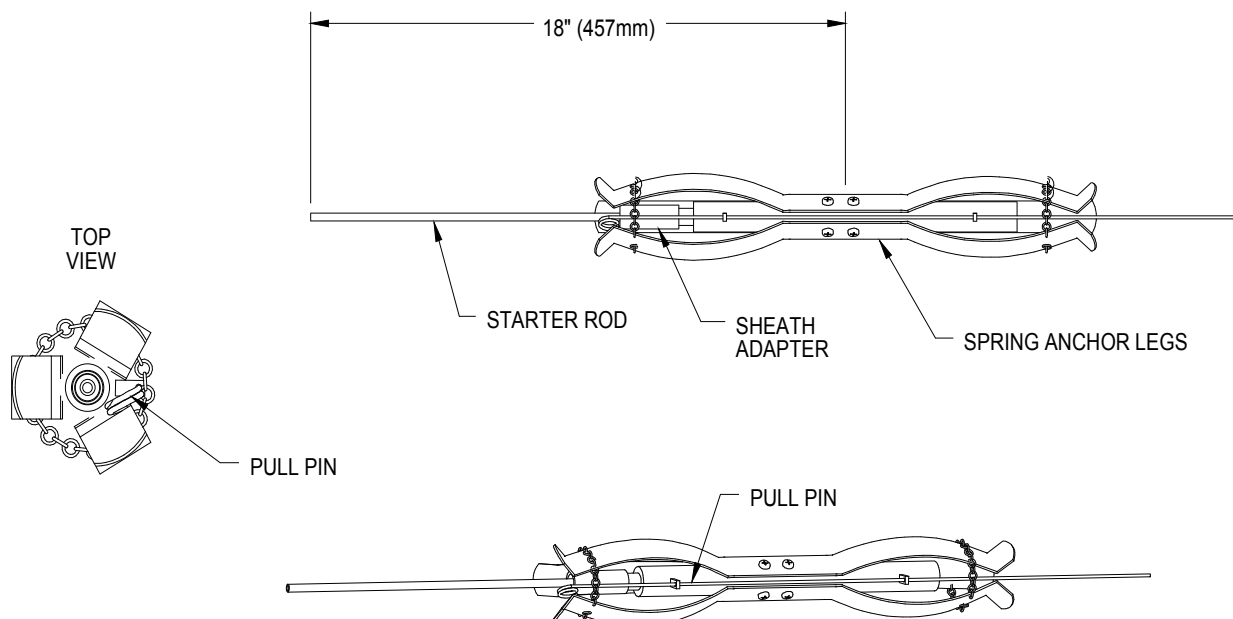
Anchor Arrangement (Spring Anchors Shown)
